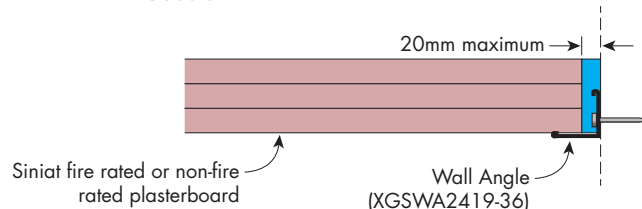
Finishing Detail - Shadowline Wall Angle
